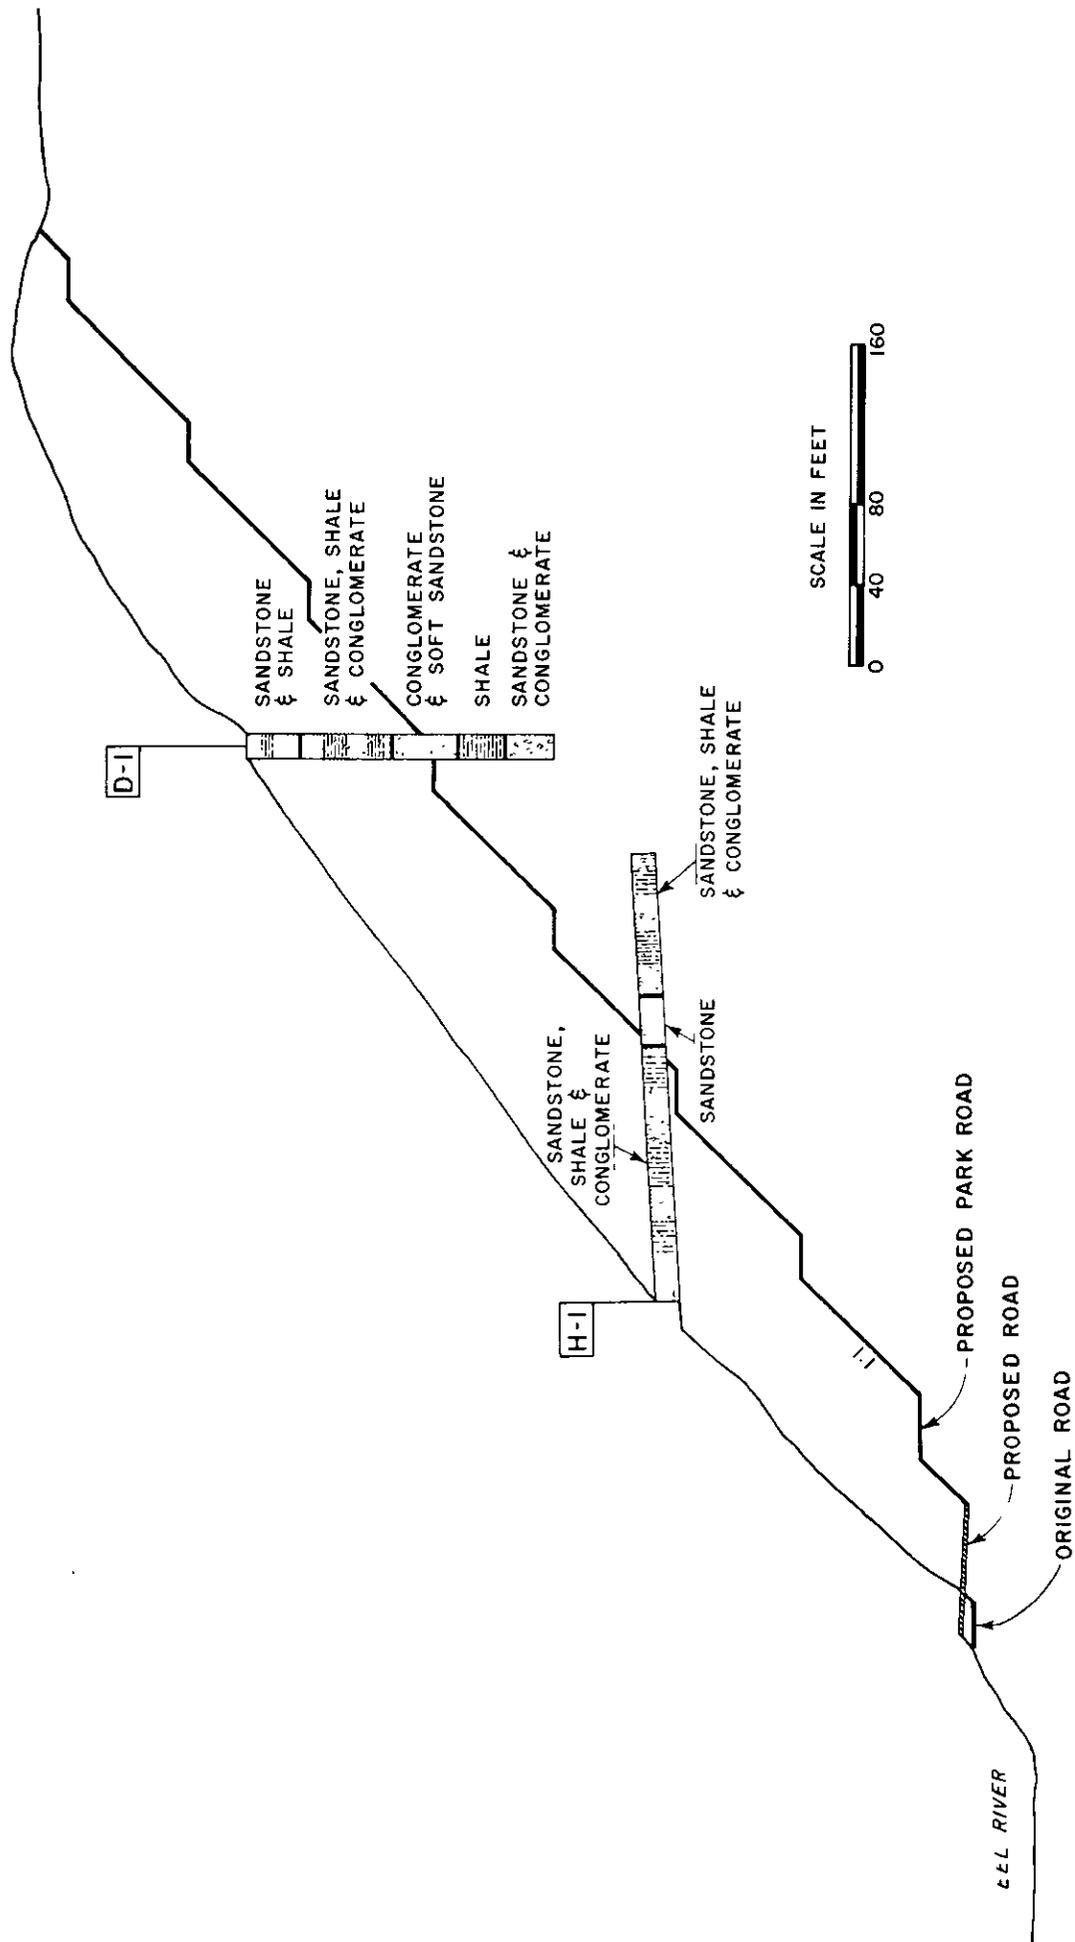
TYPICAL SECTION OF DYERVILLE CUT SHOWING
